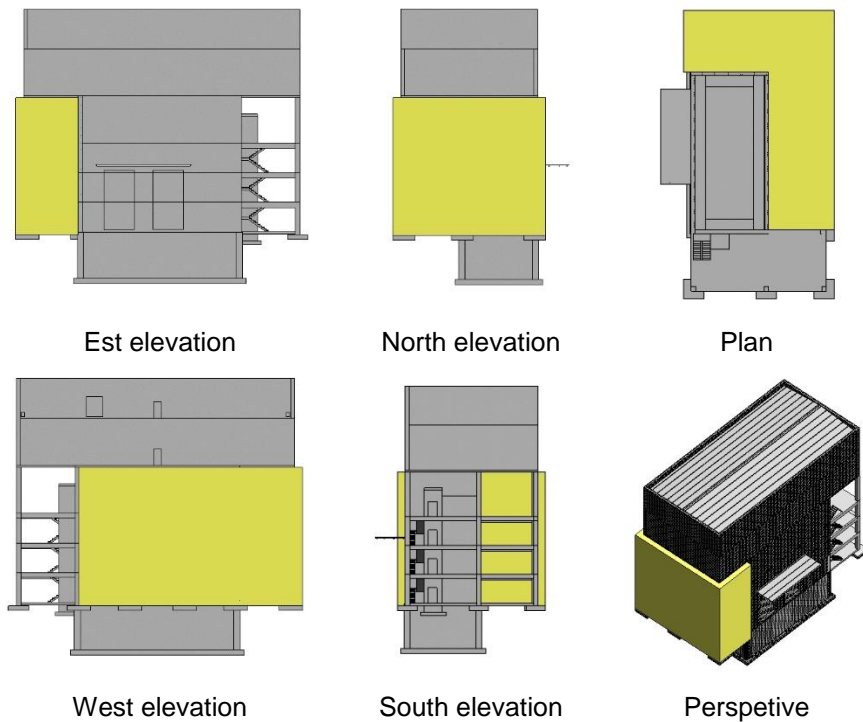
Elevations, plan and perspective of the volume occupied by the falsework (yellow) for slab formwork
